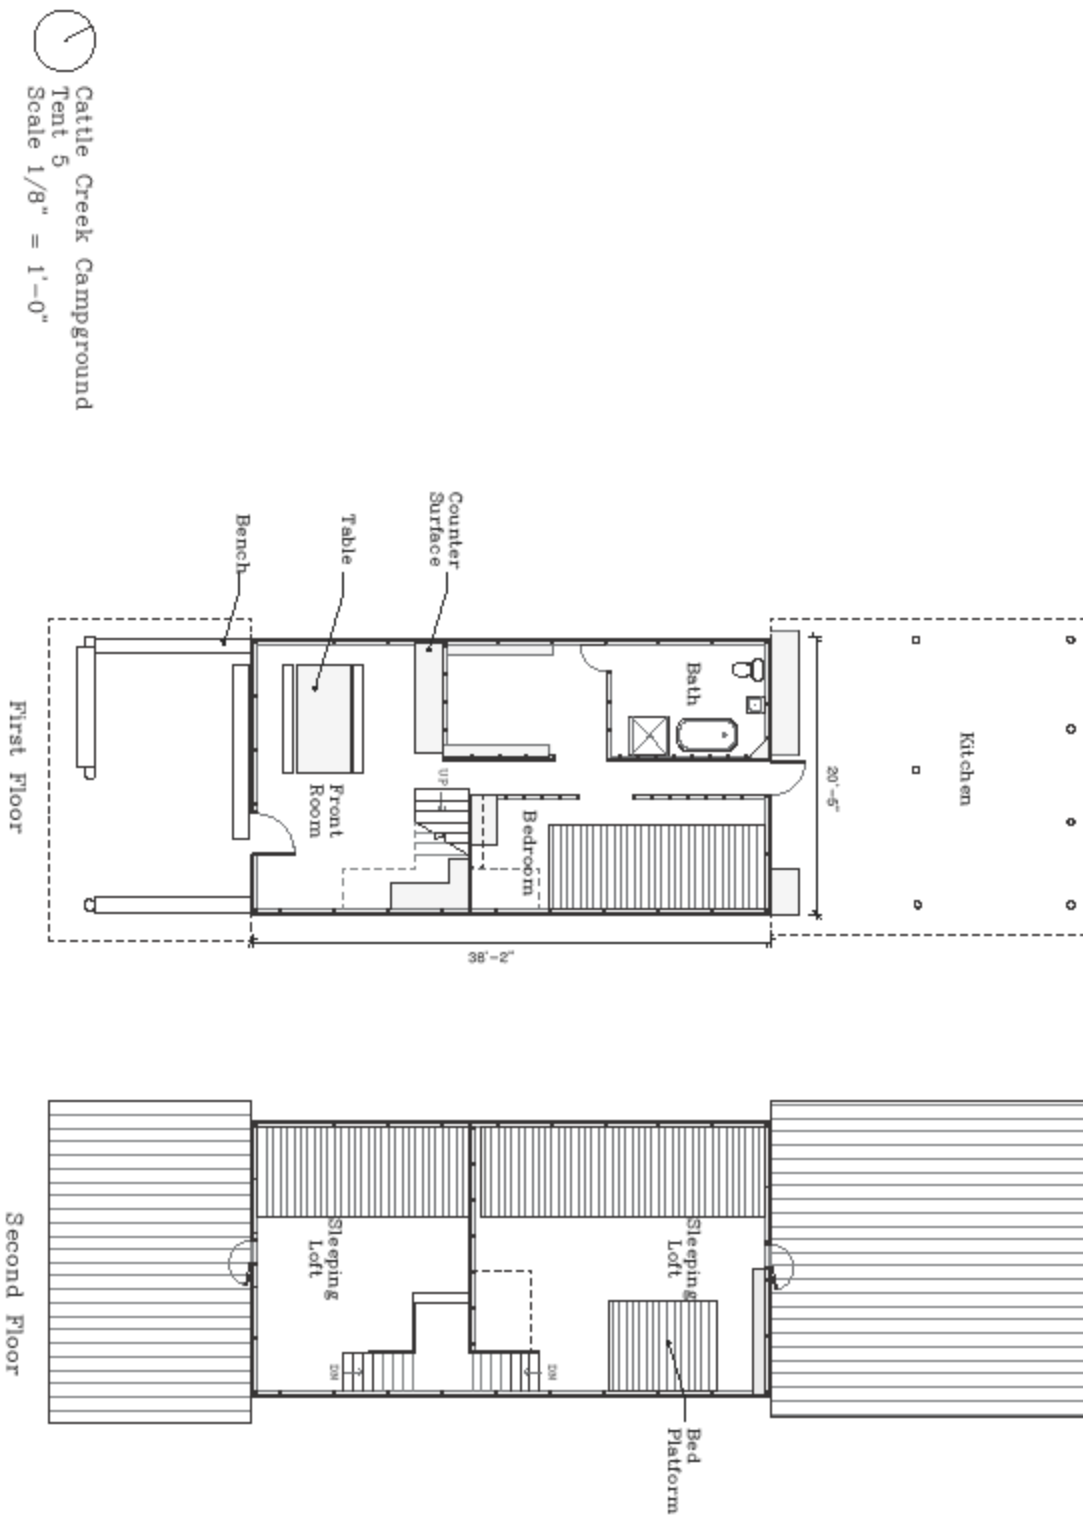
Floor Plan of Tent 5 at Cattle Creek
